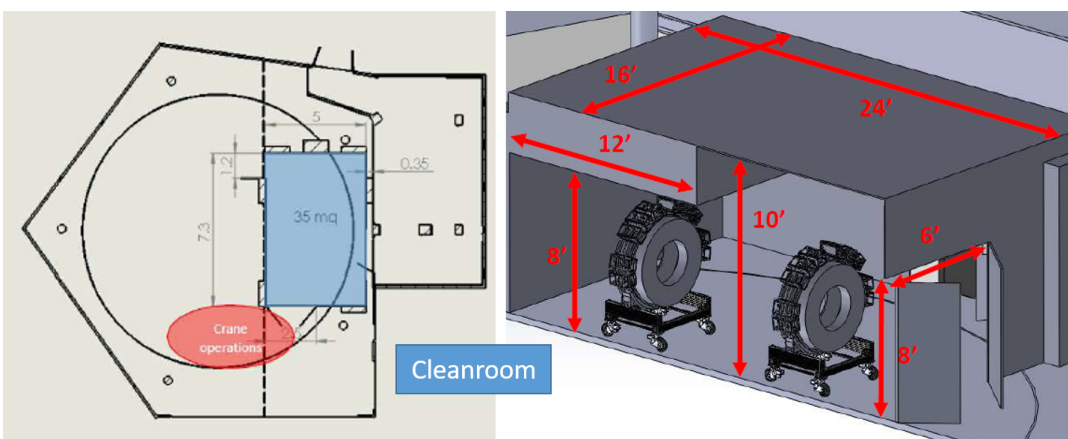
CAD image of the cleanroom plant (left) and a 3D view with the most important dimensions (right)
